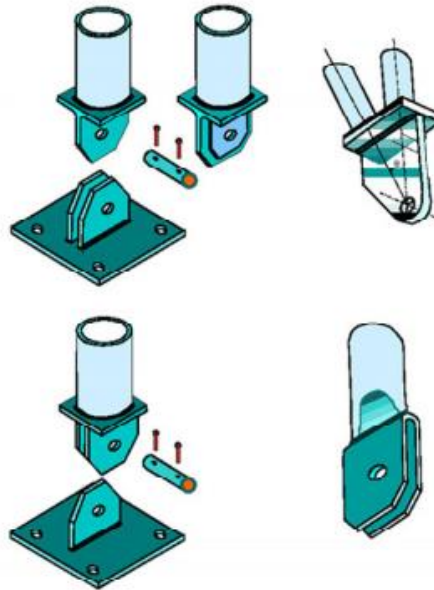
JOINTS WITH END PIECES FOR BOLTED JOINTS [WARDENIER, 2010]
